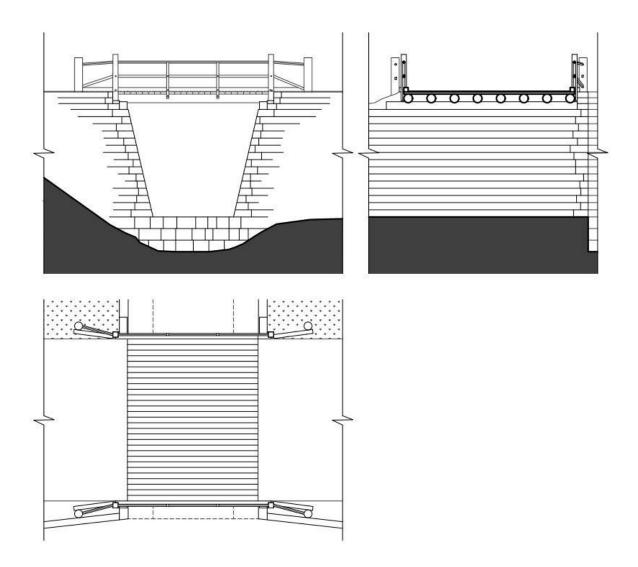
Southwest elevation, cross-section, and plan of Thomas James Bridge. (Source: OCP Architects, August 2022.)
